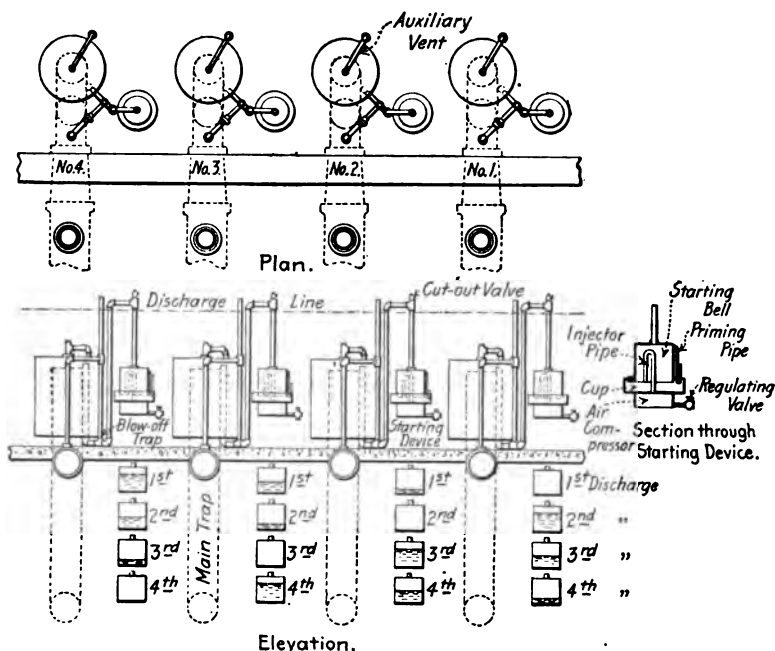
Four plural alternating siphons without connecting pipes (Miller).
